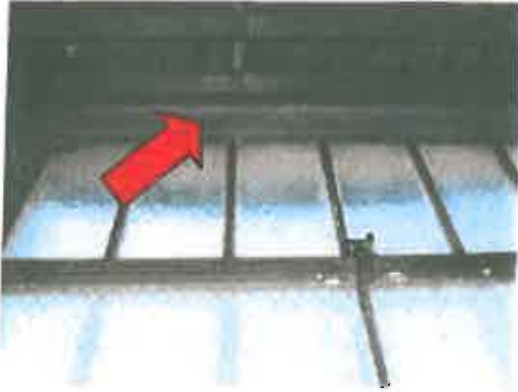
Gray painted wood beam above high-bay windows in Room 1 - LBP
